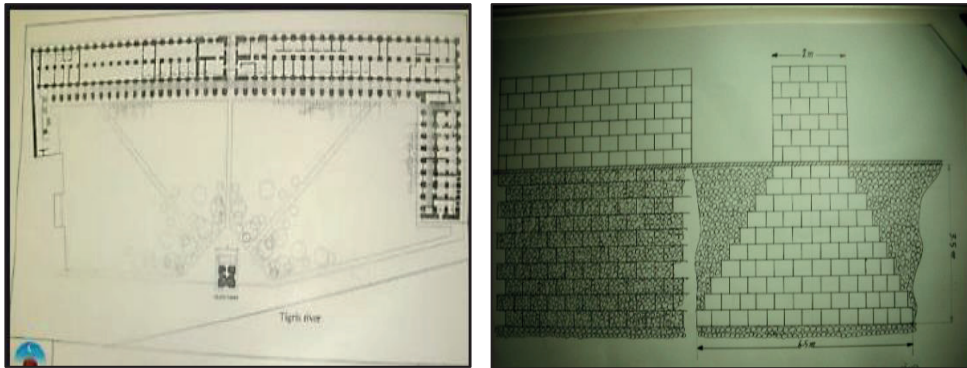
Plan and Foundation of Qishla building (*Ministry of Culture and Information, 1987*).
